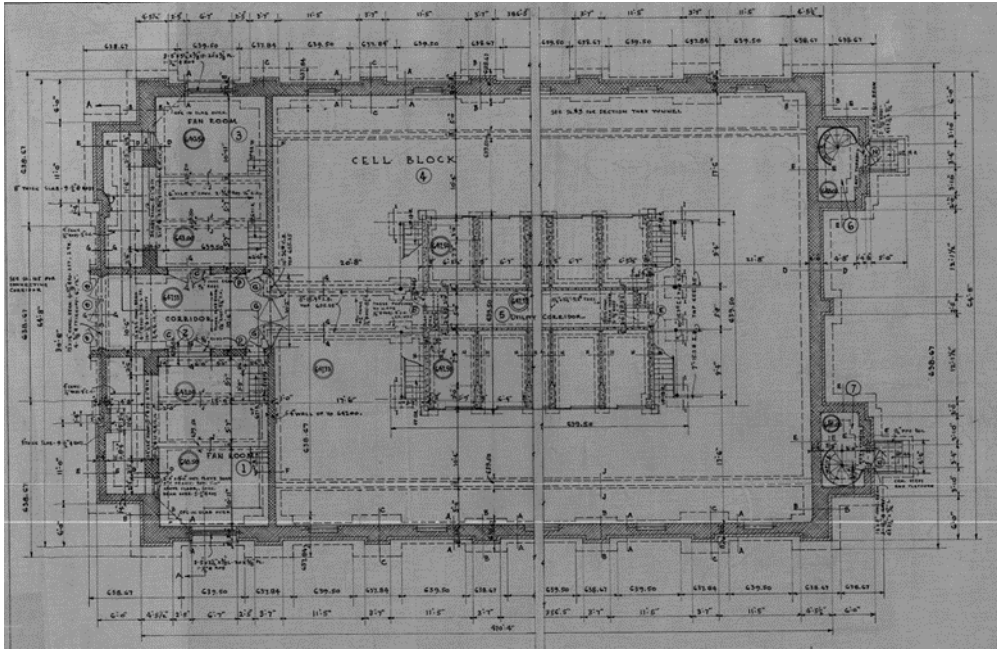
Circa 1930 Floor Plan of Quarter Houses from Drawing 104
